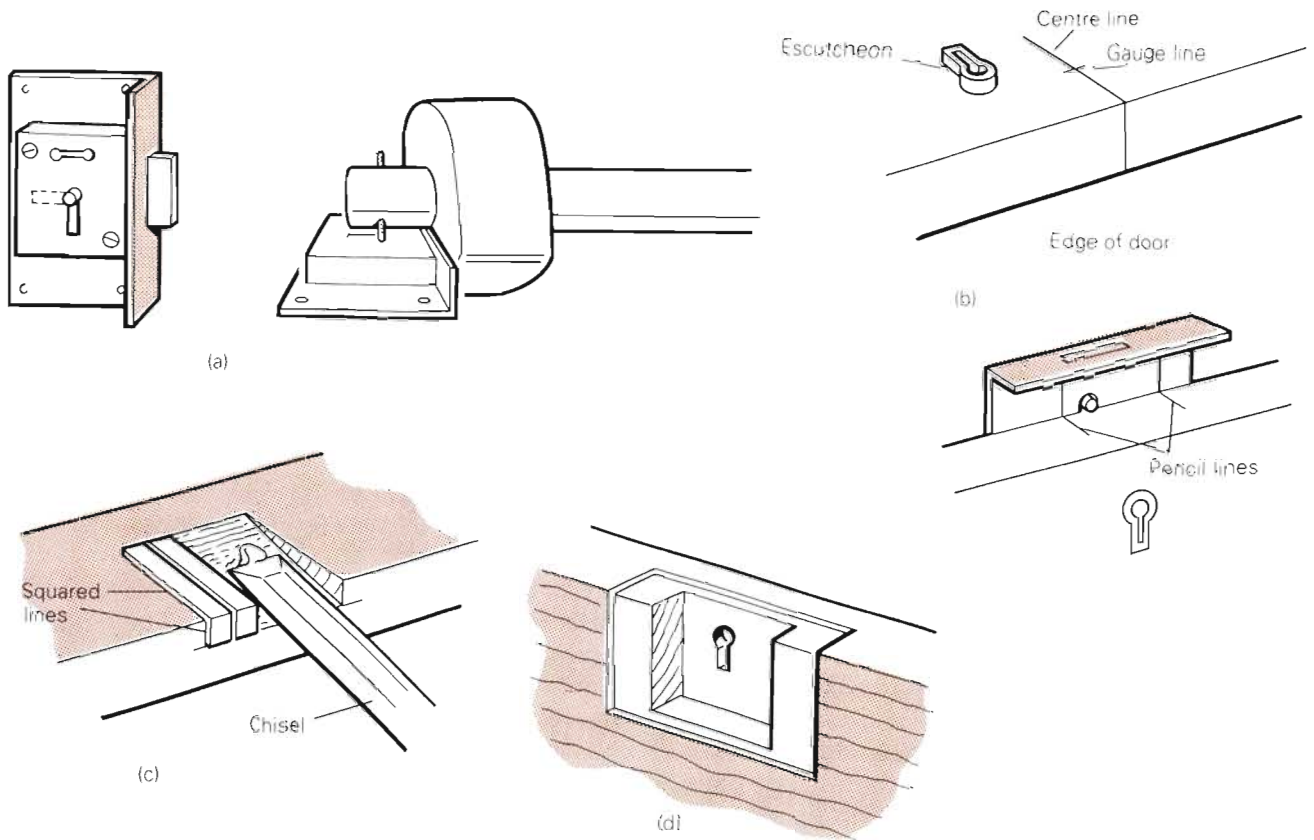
Procedure for fitting a lock: (a) setting the gauge (b) marking out, (c) paring out waste, (d) recess for the plate.
